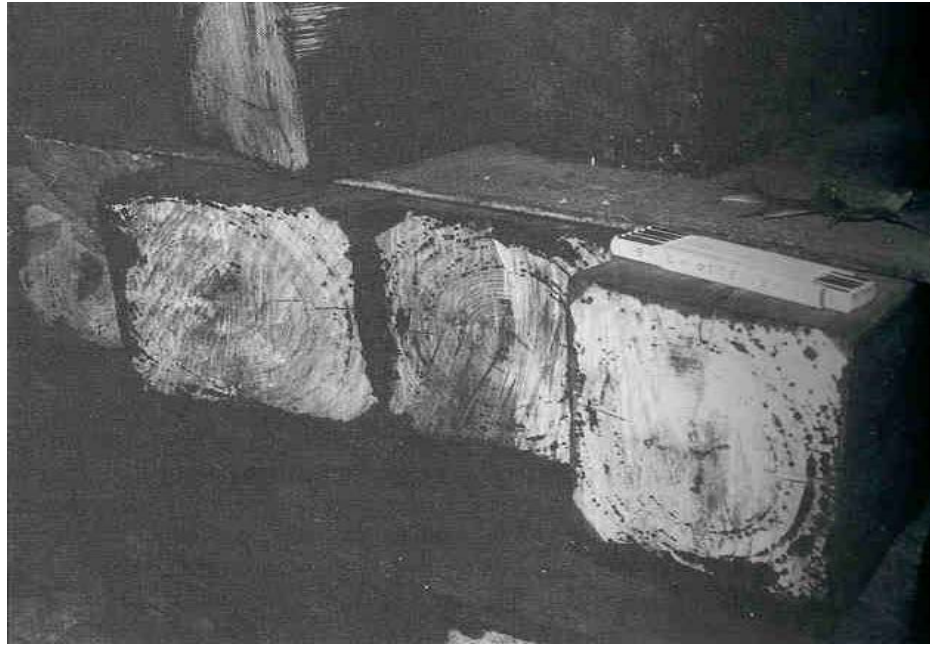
Bridge Timber Member Showing Penetration Depth of Preservative Treatment
